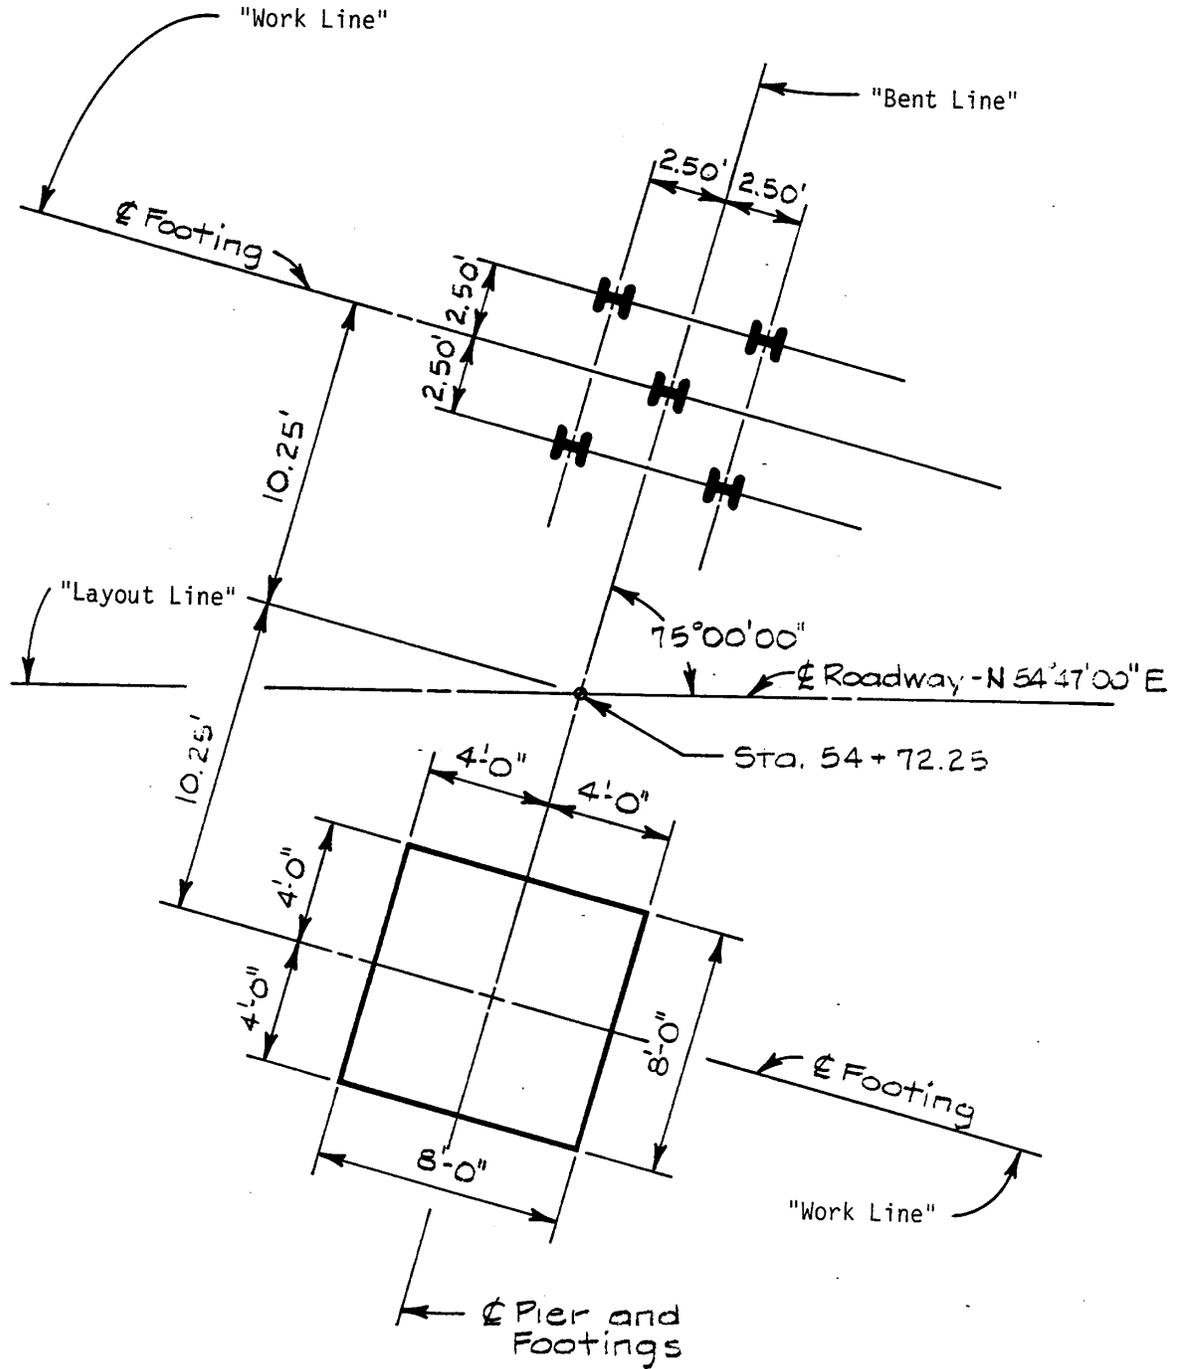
EXAMPLE SHOWING LOCATIONS OF FOOTINGS AND PILING FROM CENTERLINE OF ROADWAY (LAYOUT LINE) AND CENTERLINES OF FOOTINGS (WORK LINES)
